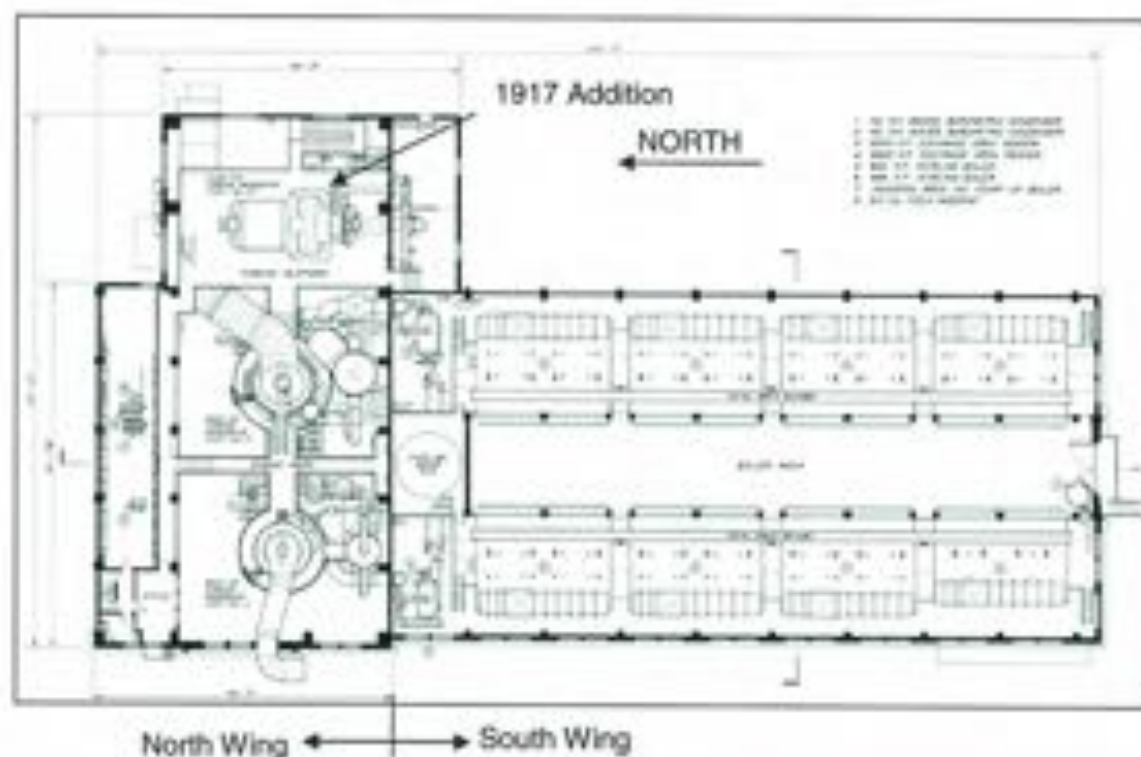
Second Floor Plan of Building (Per Historical American Engineering Record, Heritage Conservation & Recreation Service, Barry A. Richards & Yoshikado Koyama, 1982)
